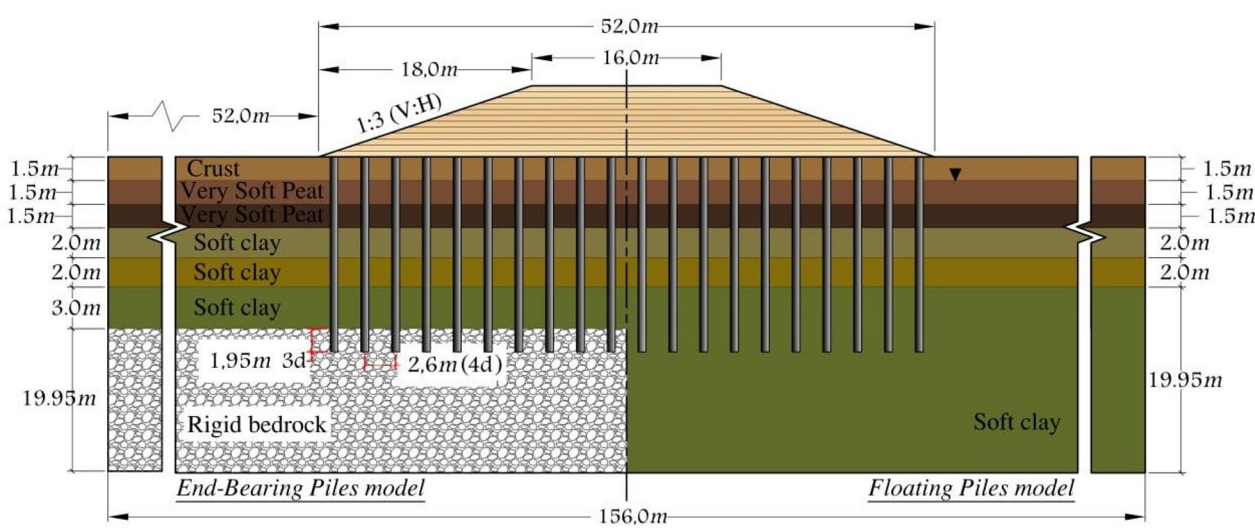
Considered numerical full-scale embankment model and sub-soil.
